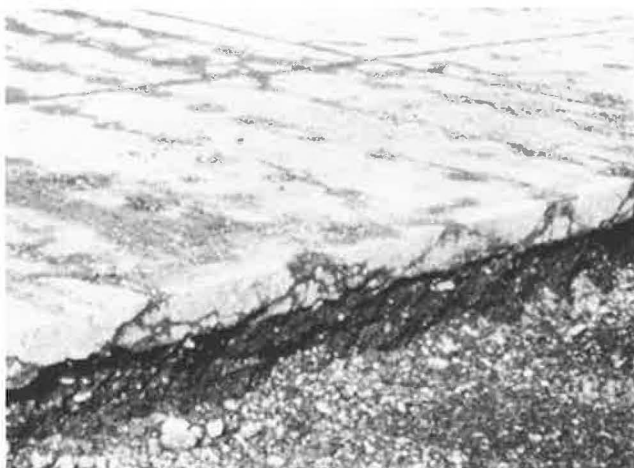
Close-up view of cut-out section demonstrating full-depth cracking.
